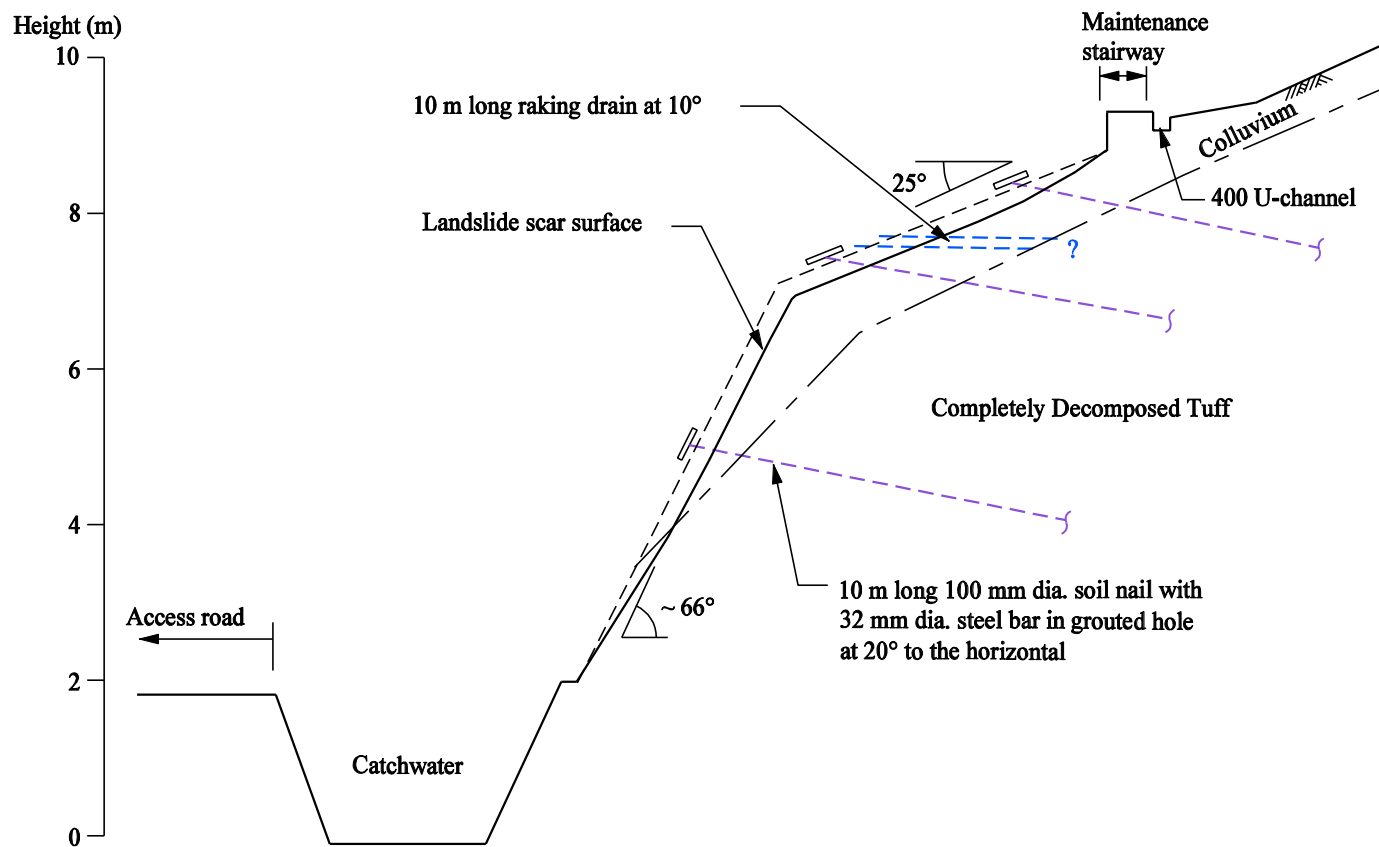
Section A-A (Slope No. 6SE-D/CR437)
